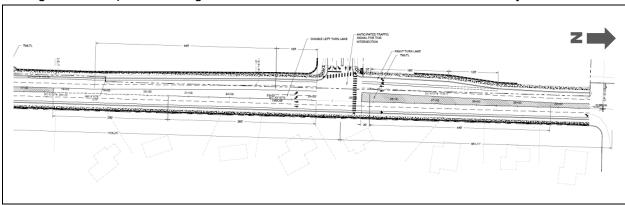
Figure A. Proposed Configuration of 228th Avenue SE/Site Access Driveway intersection
